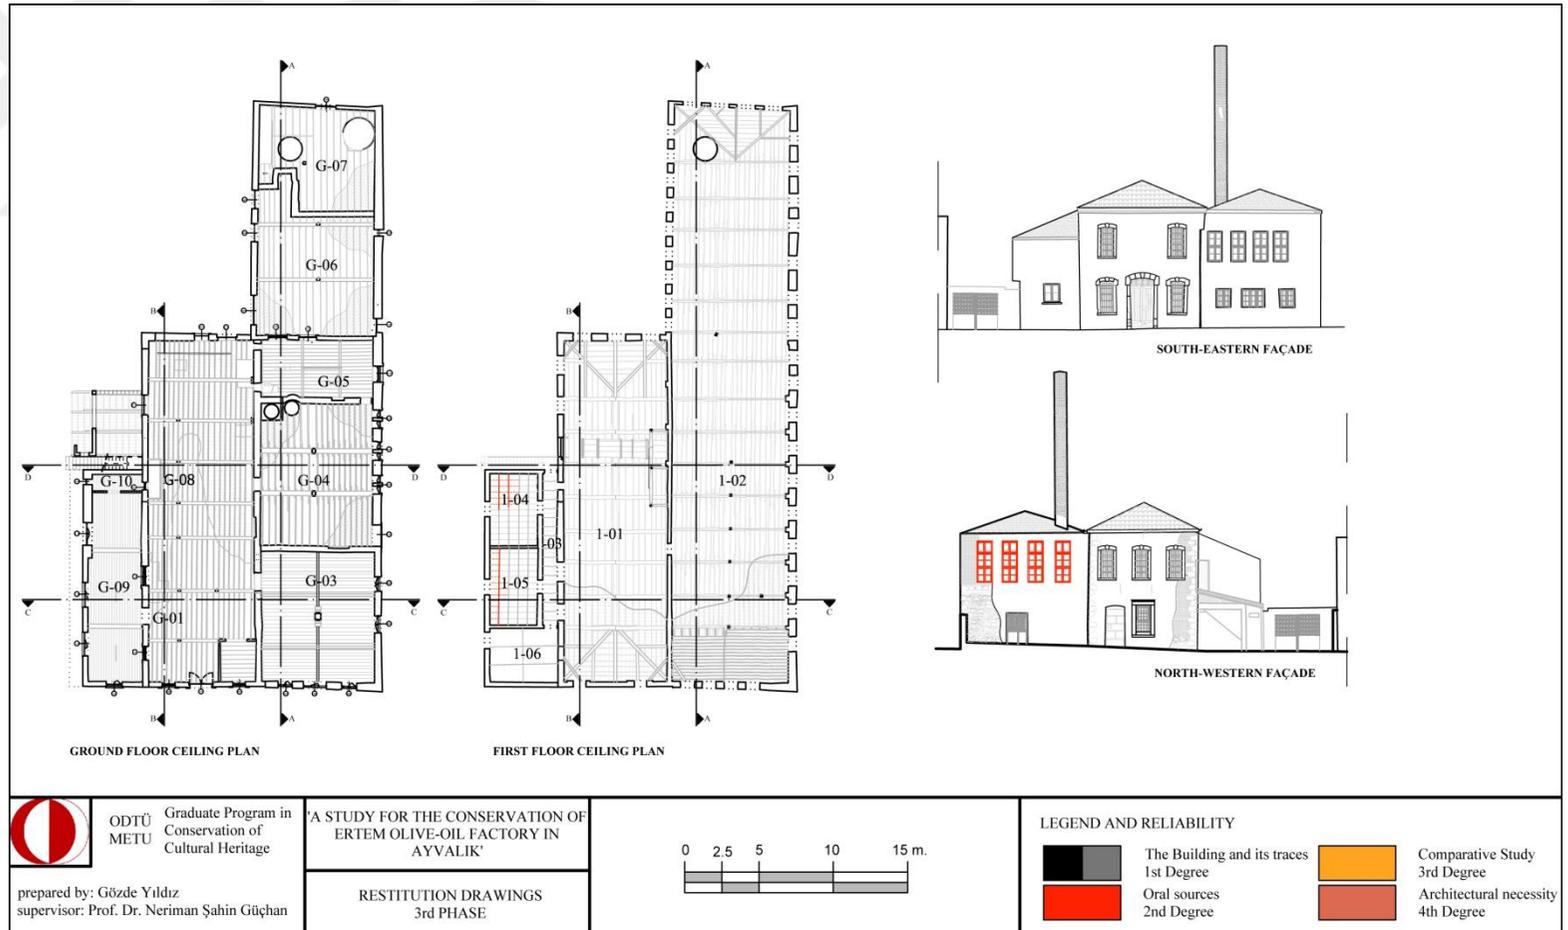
3rd Phase of the Factory, ceiling plans and south-eastern, north-western façades
